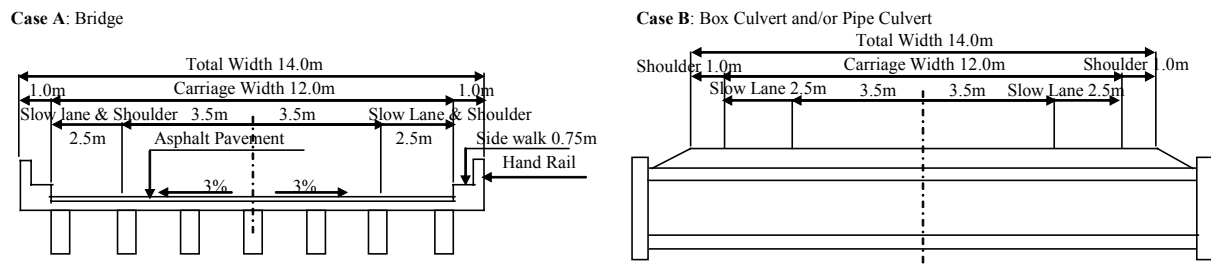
Proposed Typical Cross Sections of road on the Opening Structures
